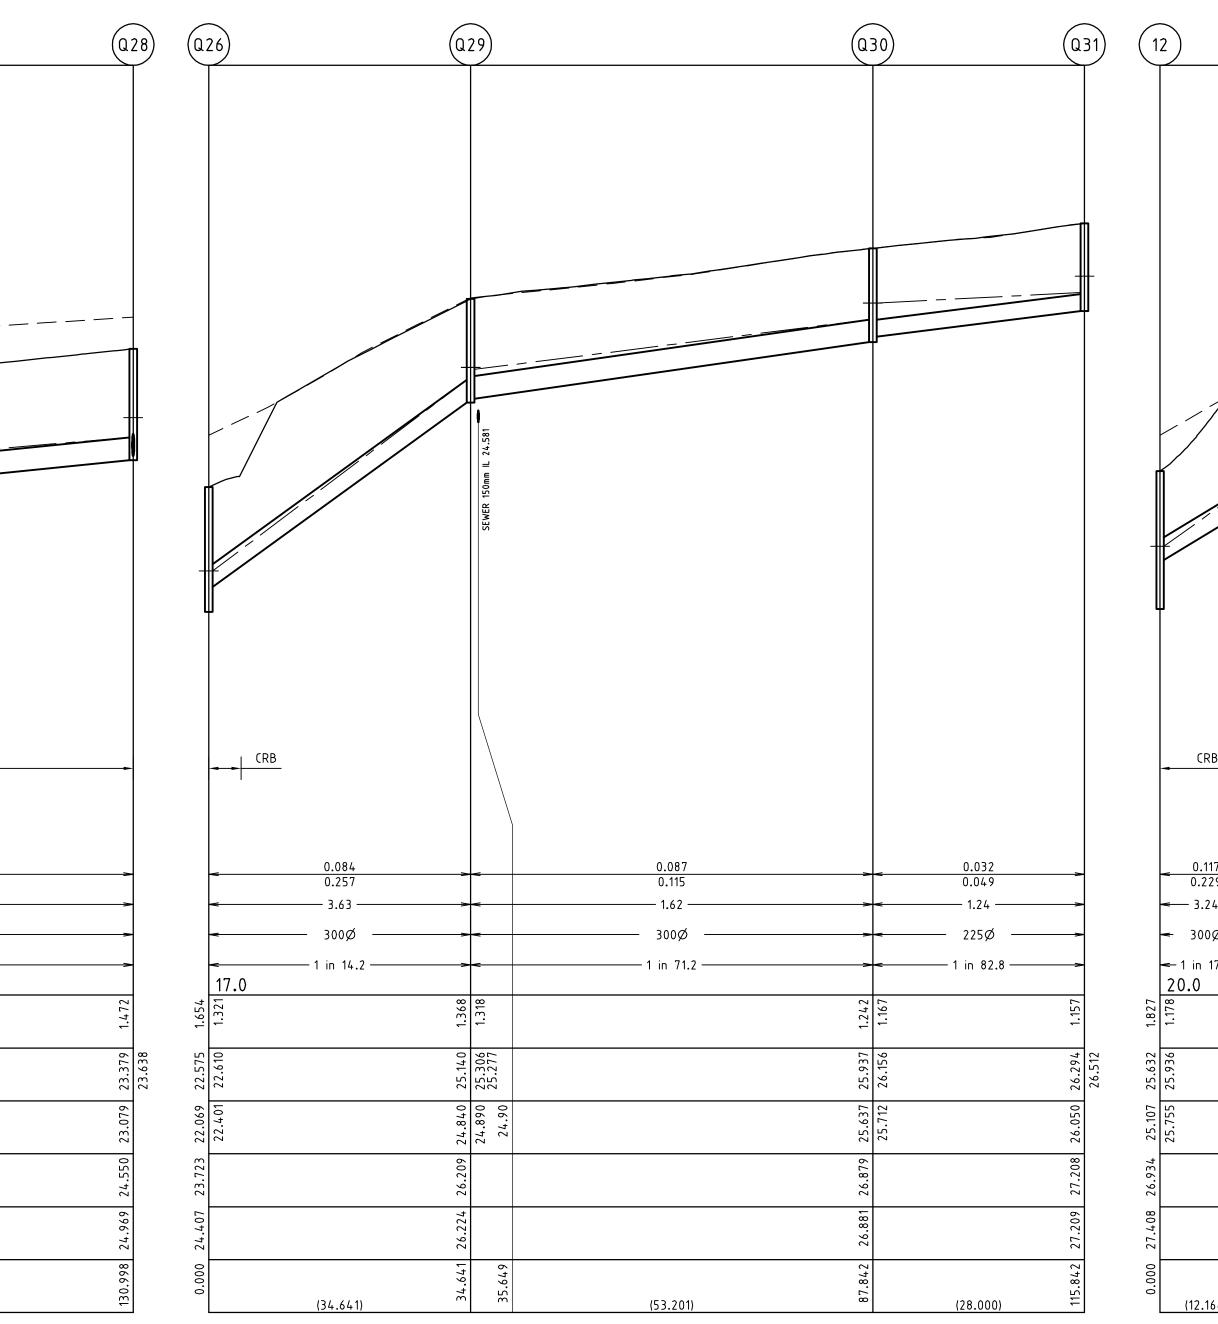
EHL-03-27 Sheet No. 27 of 34
